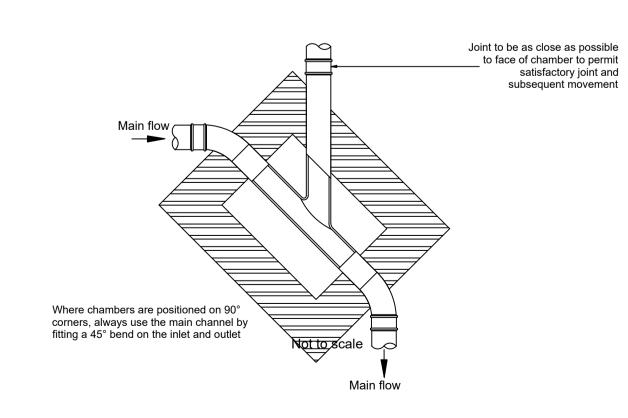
TYPICAL INSPECTION CHAMBER DETAIL - TYPE 4 (Rigid material detail) Maximum depth from cover level to soffit of pipe 1 m, non-entry
